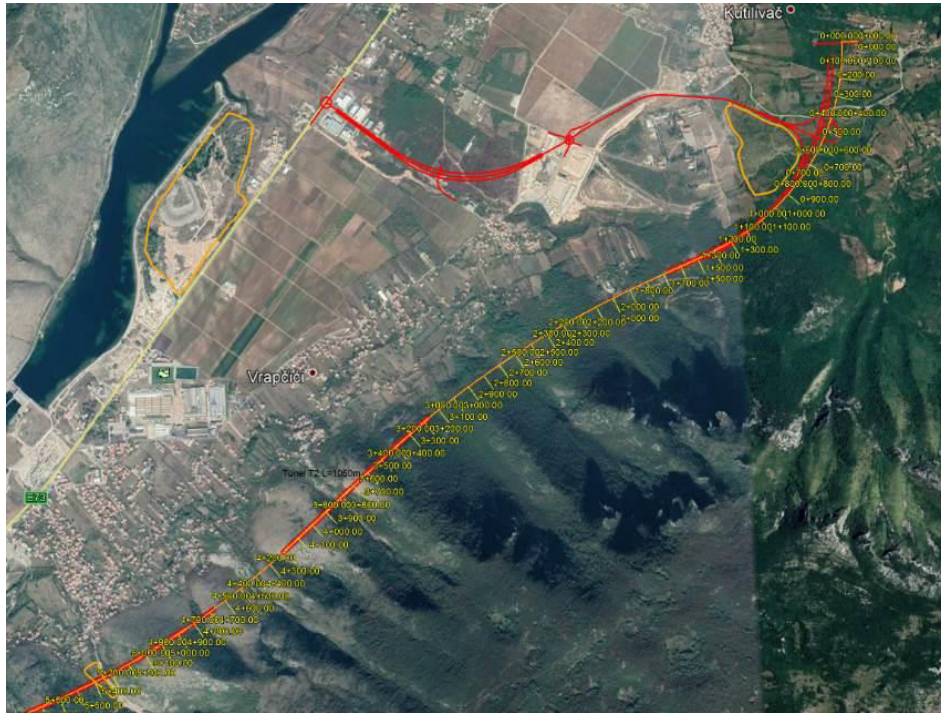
Three recommendations for potential construction landfill sites (orange polygons) (Source: Google Earth)
